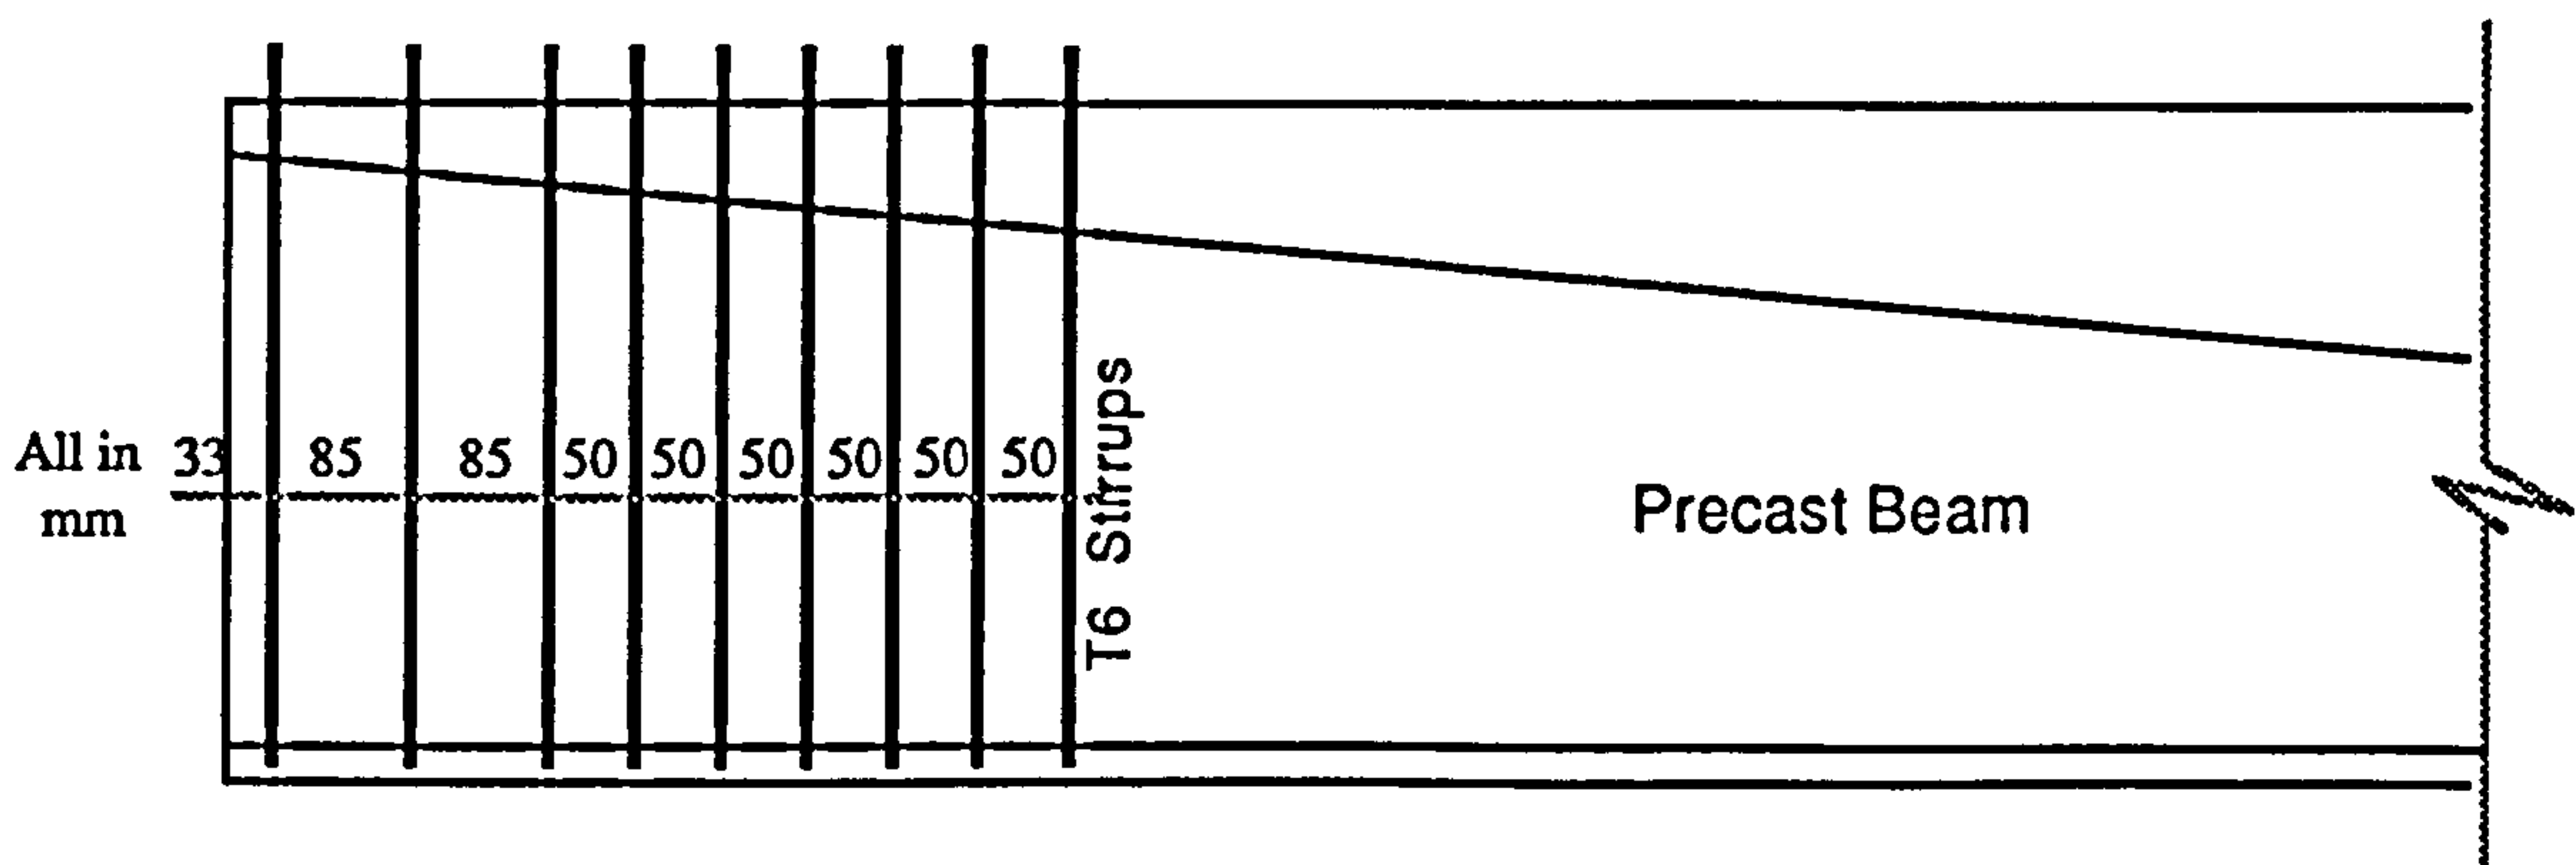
Stirrup Arrangement in the Embedment Part of Precast Beam Beams : E30AB3, E30BC4, WTFCC6, WTFPCC8,WTFCC9 (For WTFDCC10 All the bars Projected into In-situ concrete)
